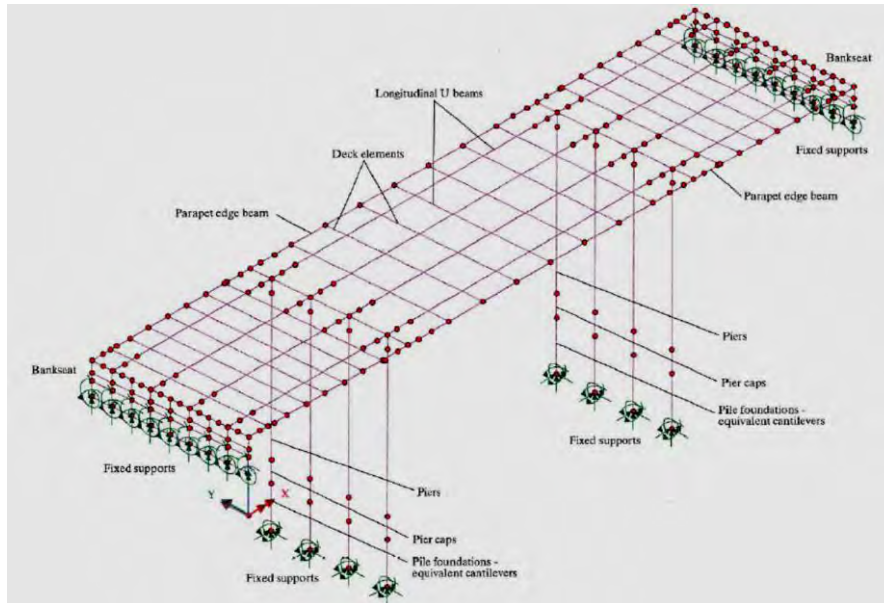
Idealised grillage model of M50 Bridge in Ireland showing equivalent cantilever concept for the pier piles (Wagle & Watt 2011)
